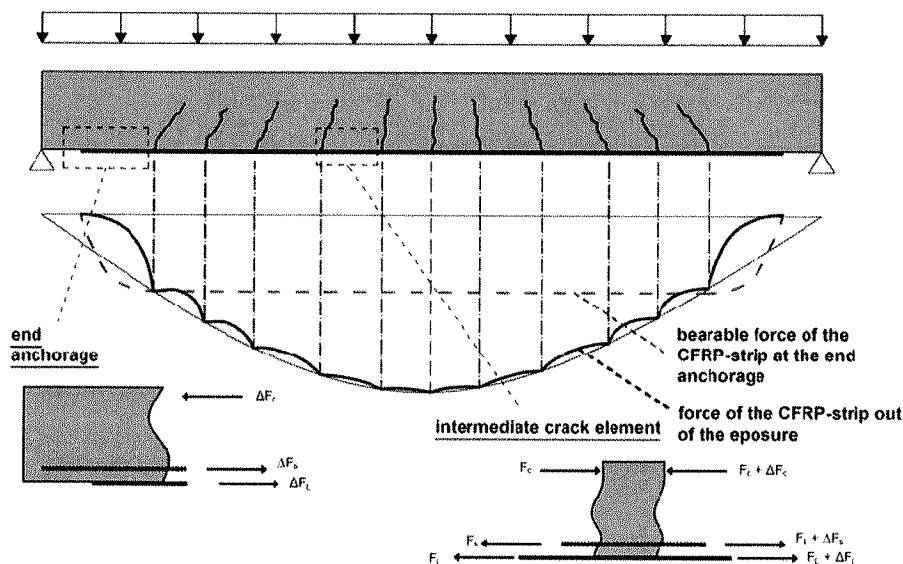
Principle of bond force transfer for structural members with adhesively applied CFRP-strips divided into end anchorage and inter-crack element
